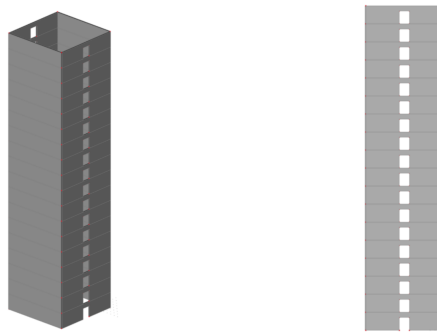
3D- and Side View of the concrete core (example with 21 storeys and floor plan C)
